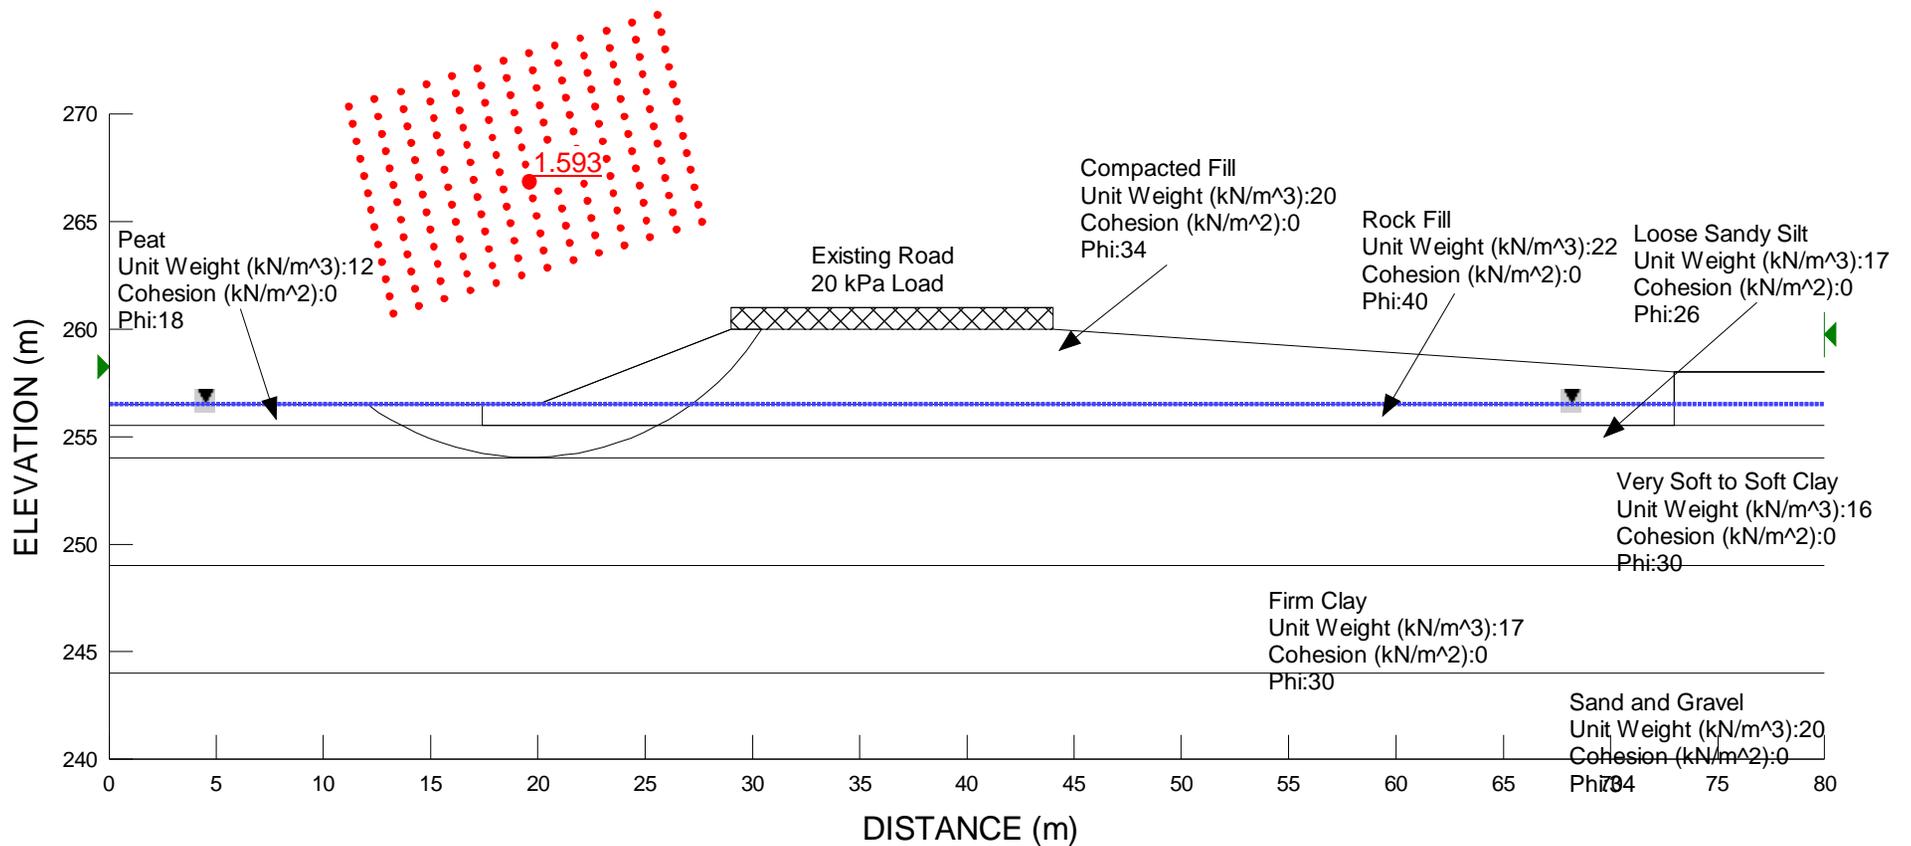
Slope Stability Analysis of Section at Station 18+975 - 2.5 m Road Widening with Toe Berm (End of Construction - Shallow Slip Surface)
